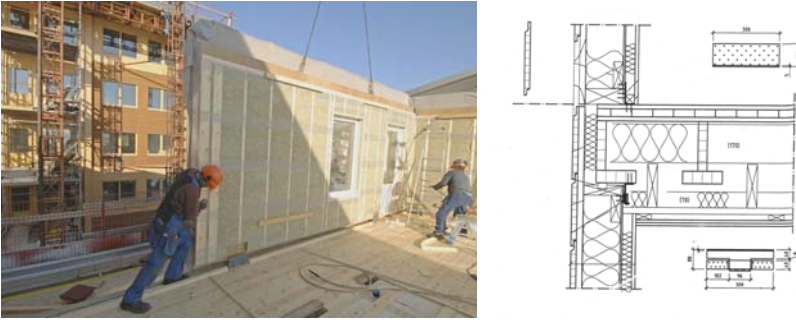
Placing of wall elements (left) and a cross-section of the wall structure (right) A separate board is placed on site to cover the horizontal element joints.
